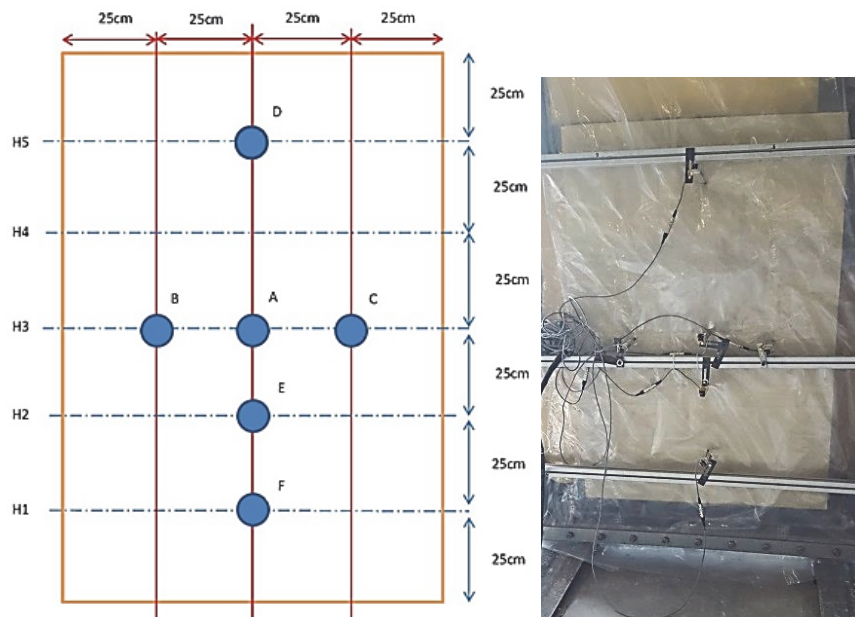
Arrangement of potentiometers on panels (for all tests)
